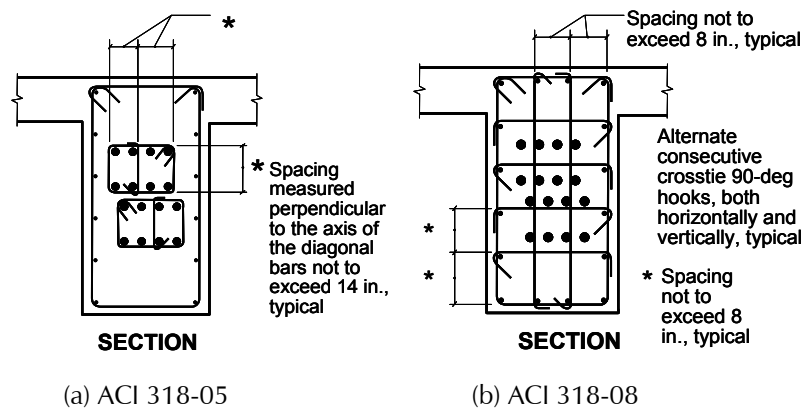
Coupling beam reinforcement detailing for: (a) prior ACI 318 provisions; and (b) current ACI 318 provisions.
